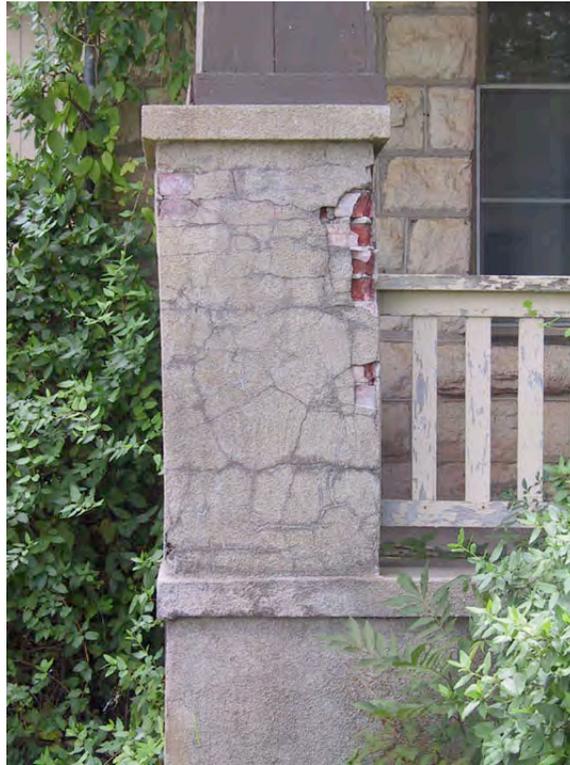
Northwest pier on front porch. (Photo by the author)
